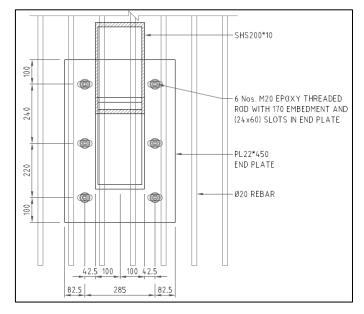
Strut-Girder connection (Plate details) (dimensions in mm)
